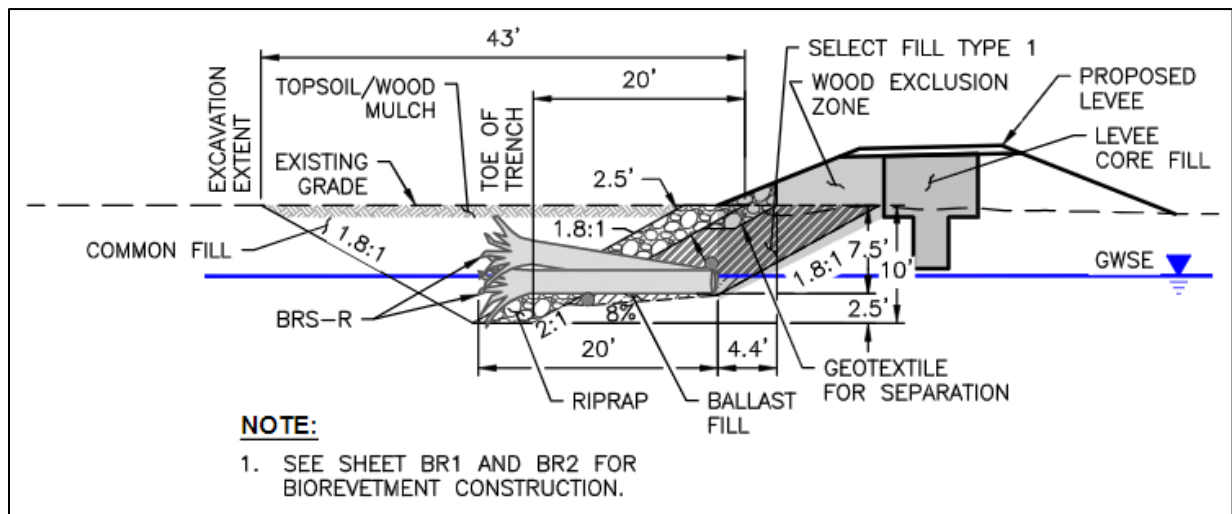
Figure C. Typical Levee and Biorevetment Geometry, Section A-A'
